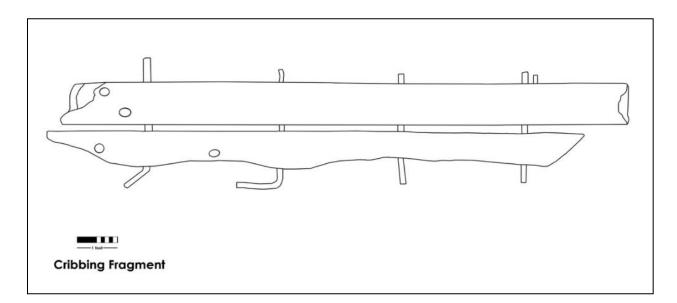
Plan view of pier fragment located north of the Jay Road terminus.
